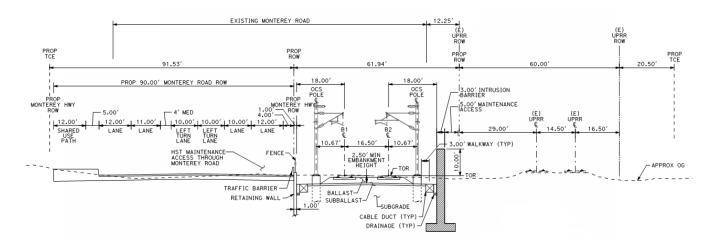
Typical Section in Subsection Monterey Corridor (At Grade)
